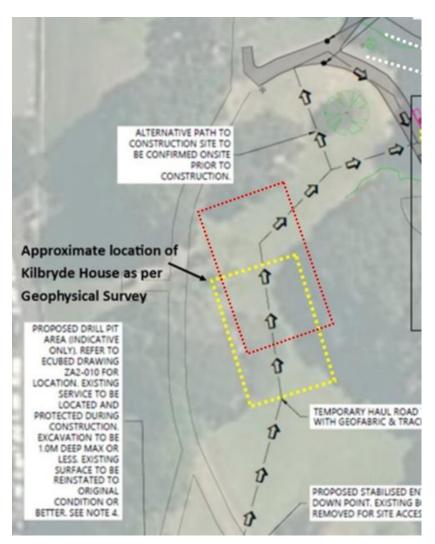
Detail of project plan showing the proposed haul road alignment (shown as arrows) overlaid with the location of the Kilbryde House foundations as per the results of the geophysical survey (outlined in yellow); location of Kilbryde House as identified on historic survey plans (outlined in red).
